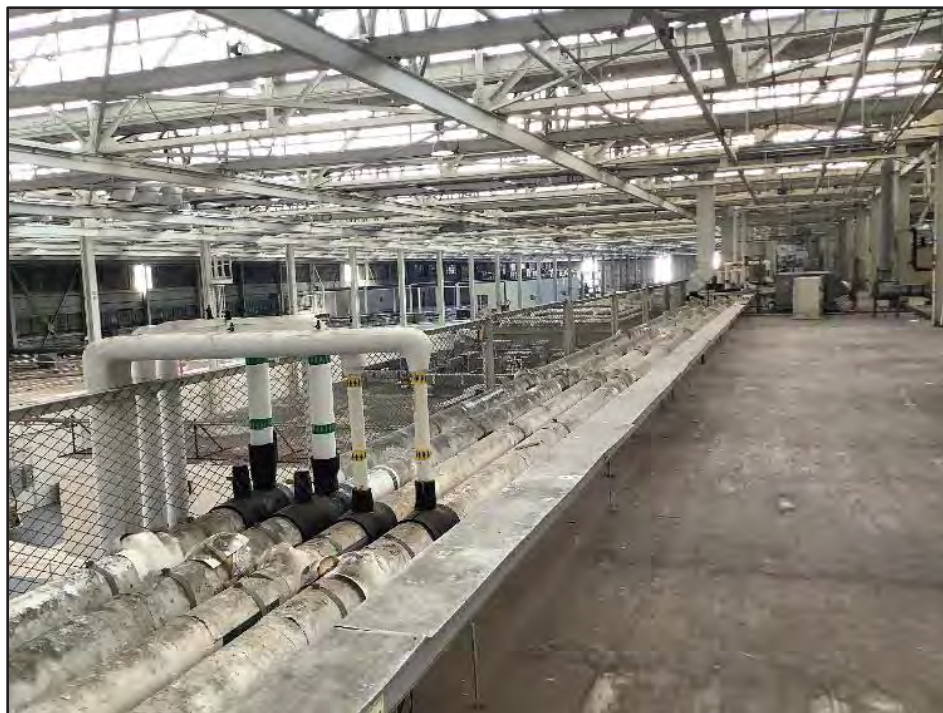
Building 1 Interior, Third Floor Mezzanine. View toward the west.
